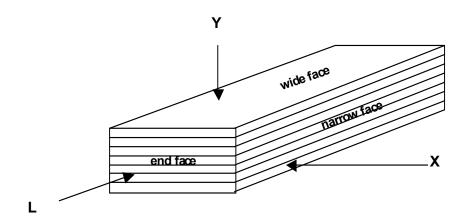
WEST FRASER™ LVL FASTENER ORIENTATION
